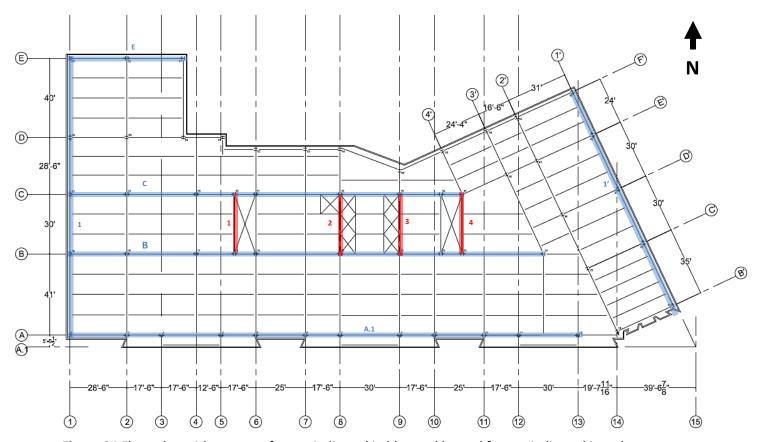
Floor plan with moment frames indicated in blue and braced frames indicated in red
